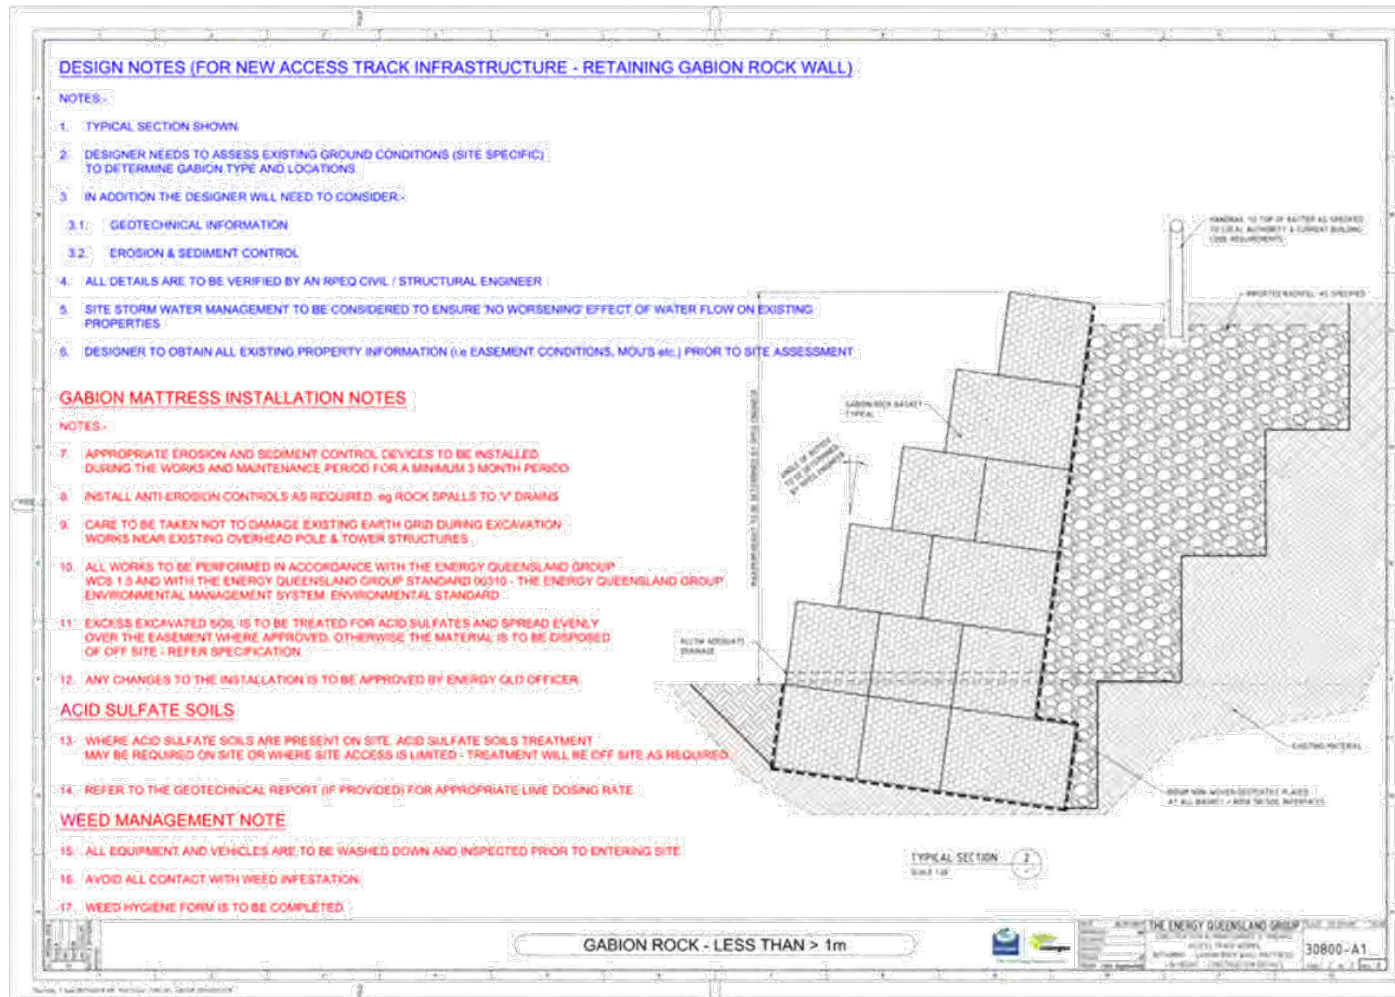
Access Track Infrastructure – Land Stabilisation – >1m Gabion Rock Wall Mattress Details.
